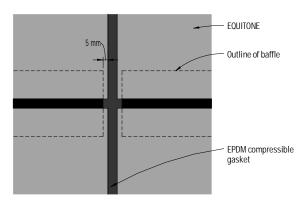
Baffled horizontal joint junction with vertical joint - Elevation
